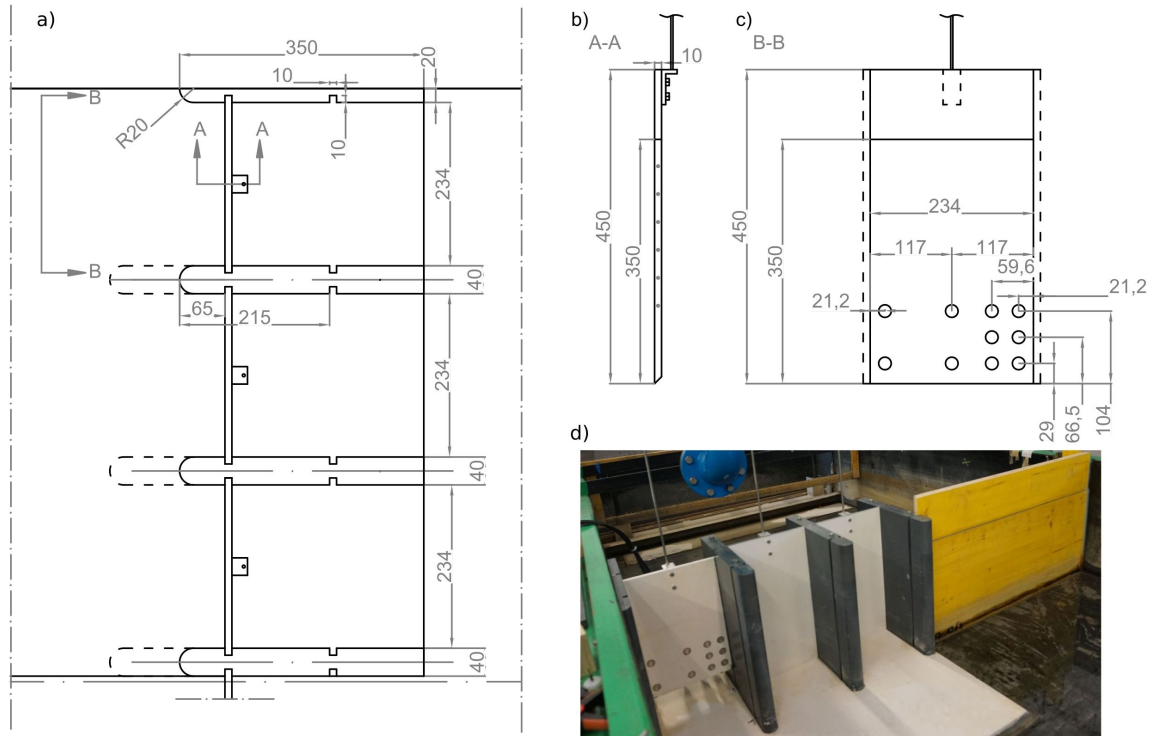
Final construction of the gate structure (small scale model): a) plan view, b) cross section of the gate, c) upstream view of the gate and locations of the sensors, d) overview
